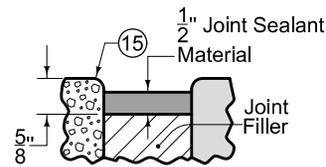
Detail F or Detail G (See Bar Size Table for Doweled Expansion Joints)
